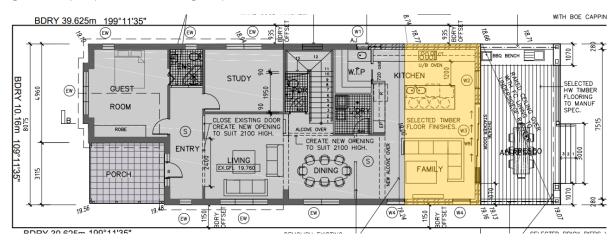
Proposed ground floor plan, with the proposed additions highlighted in yellow (Source: Fedele Design P/L)
